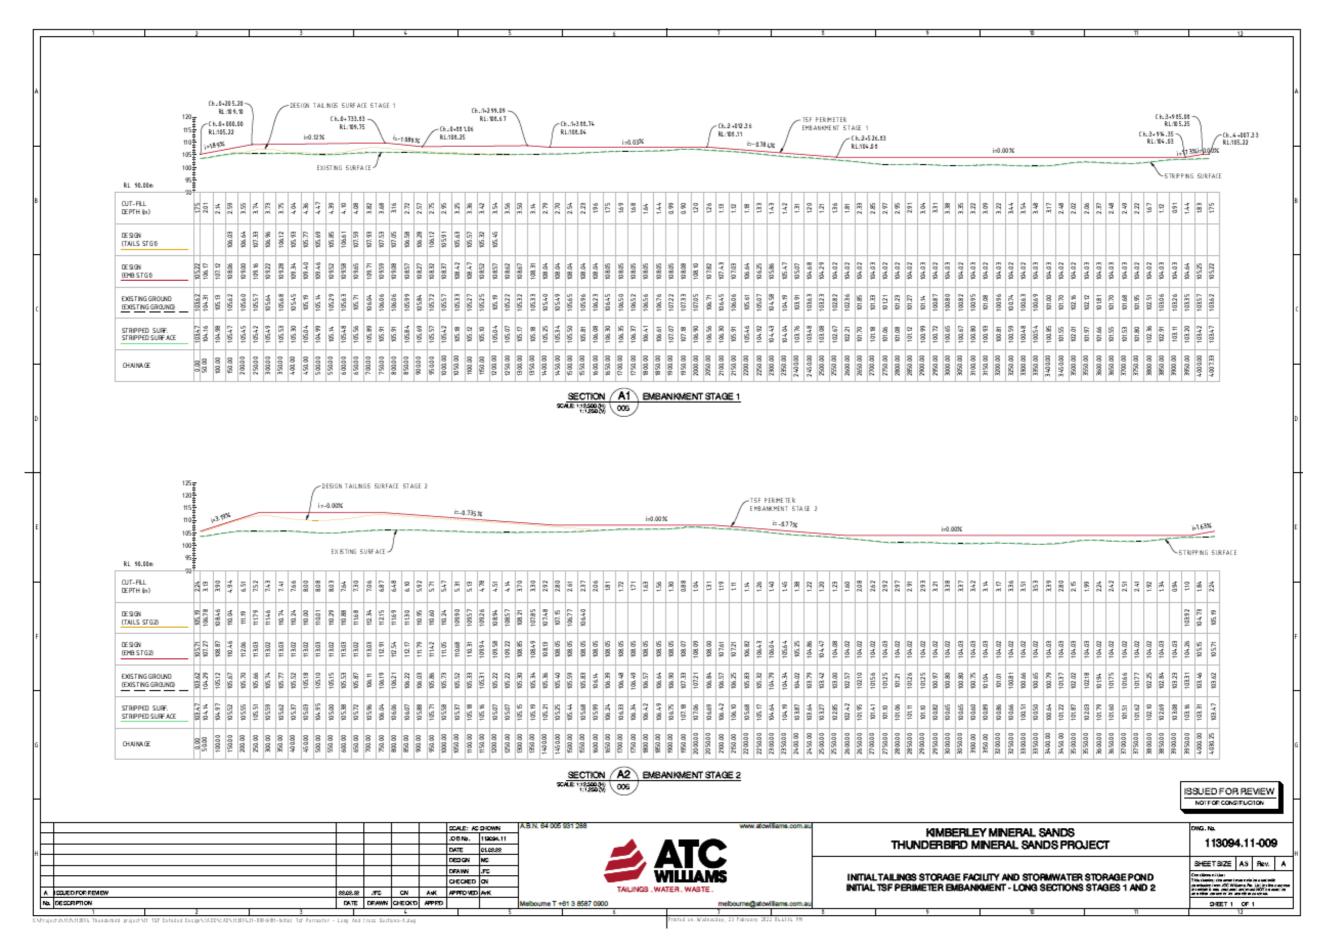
Drawing – Initial TSF and SPP, TSF perimeter embankment, long sections stages 1 and 2
